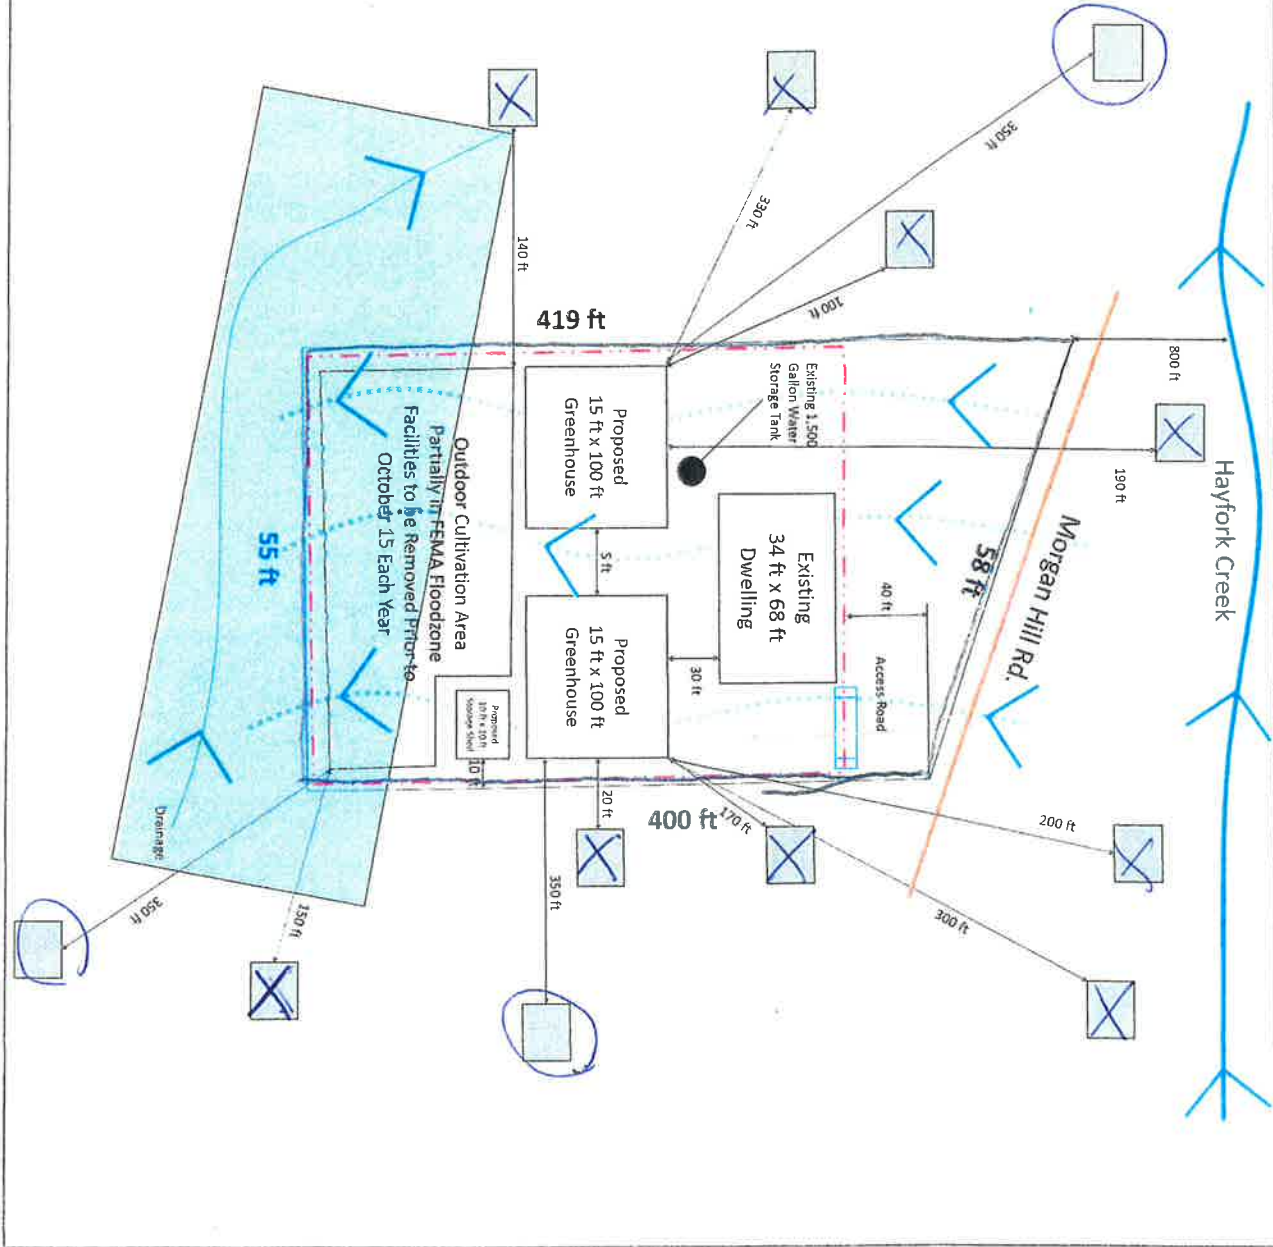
SITE PLAN AND AFFECTED RESIDENCES
